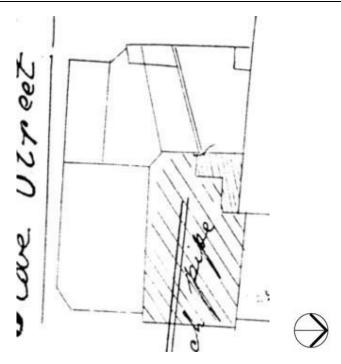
This sketch plan of 'Riley's Drainage', dated 30th March 1865, shows a 9 inch pipe connecting to the City Council's main sewer/drain in George Street. Only the front half of the allotment is highlighted, suggesting that the rear section was part of the Patent Slip Hotel. Source: City of Sydney Archives.
